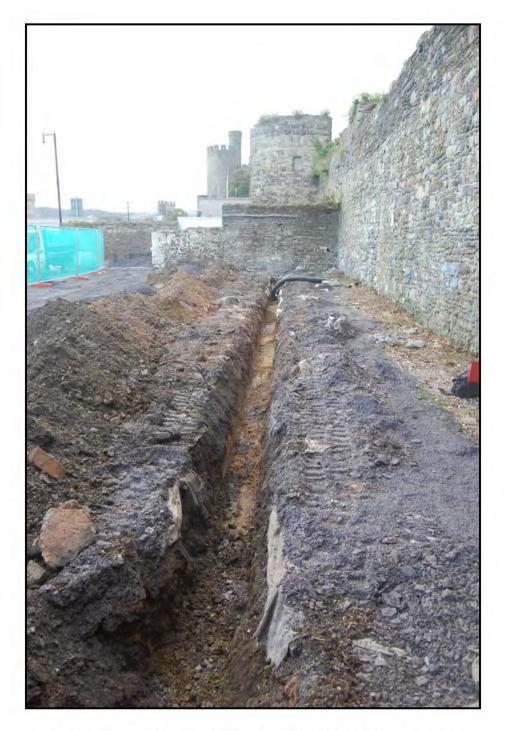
Zone 2: service trench excavation - detail of full excavation depth
